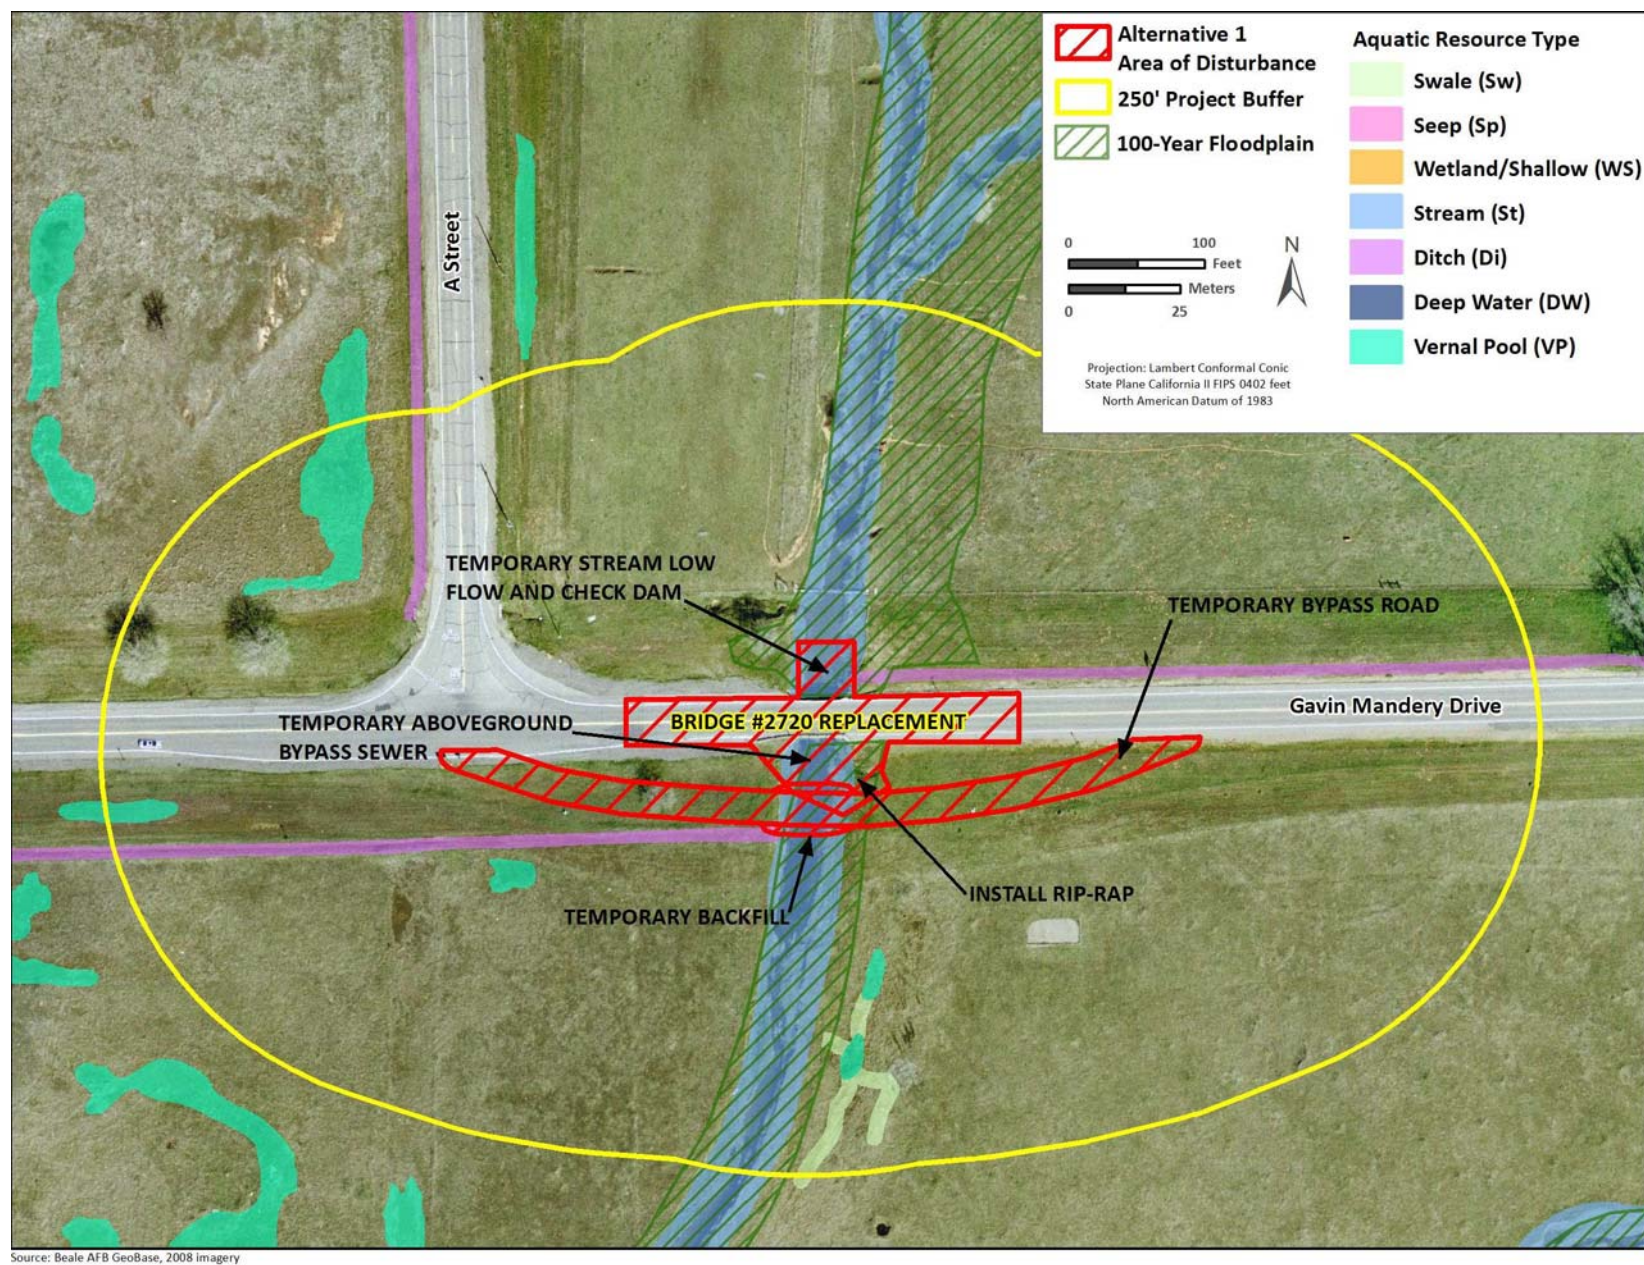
Water Features and Floodplains: Alternative 1 Replace Bridge 2720
